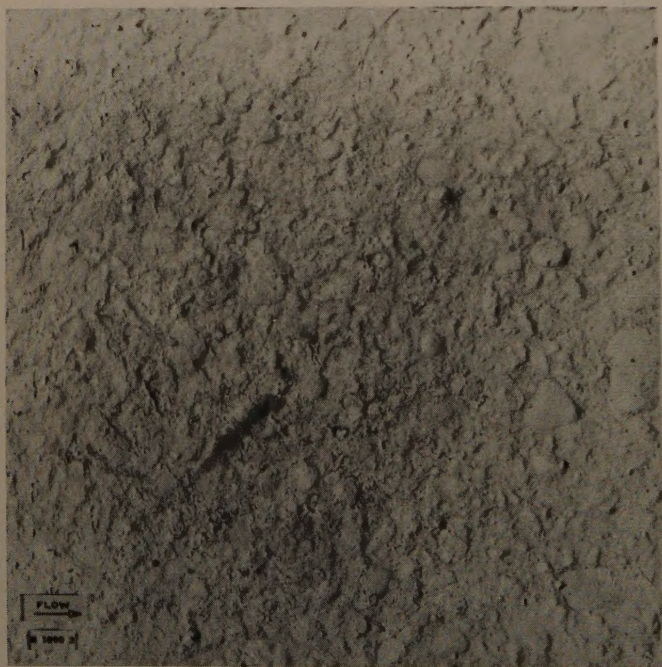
1-foot-square plaster mold of eroded surface at Davis Dam (Specimen No. 3).
